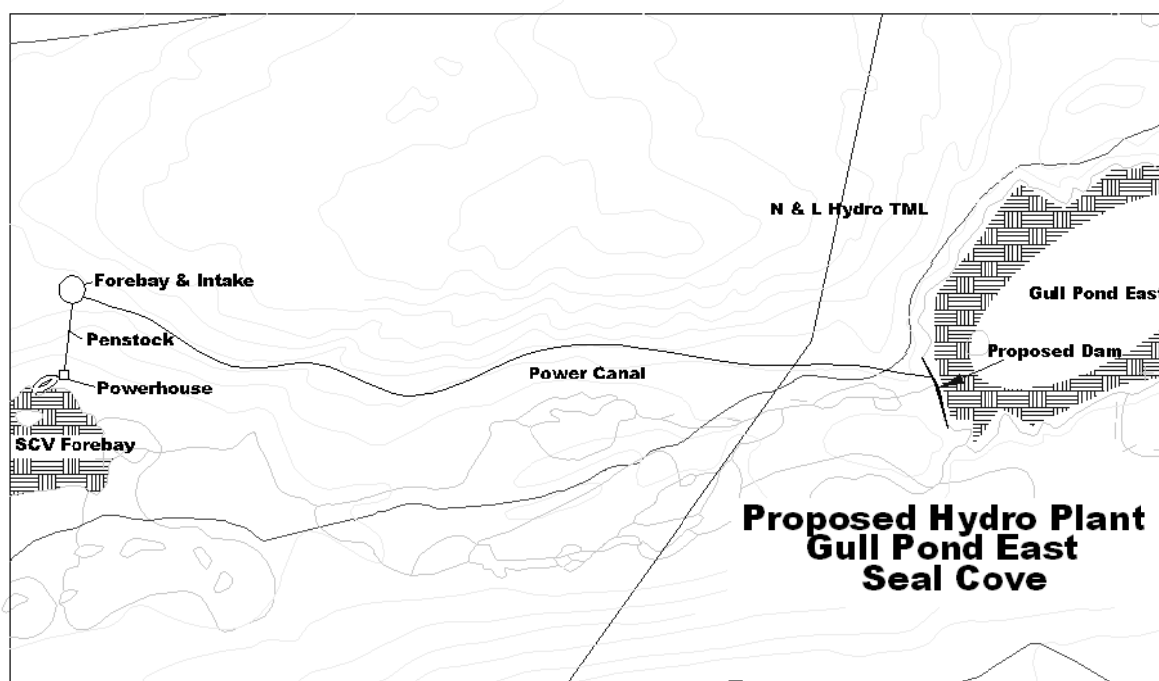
Conceptual Layout for Proposed Plant at Gull Pond East
